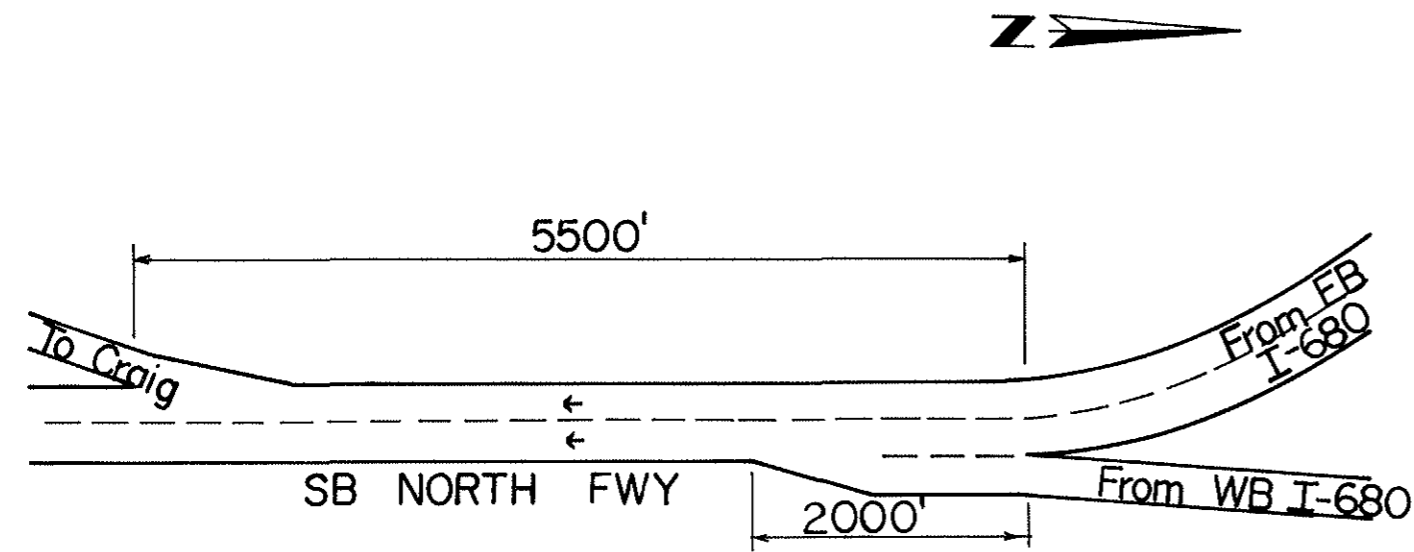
Southbound Merge Section, I-680 To Craig, East Alignment
